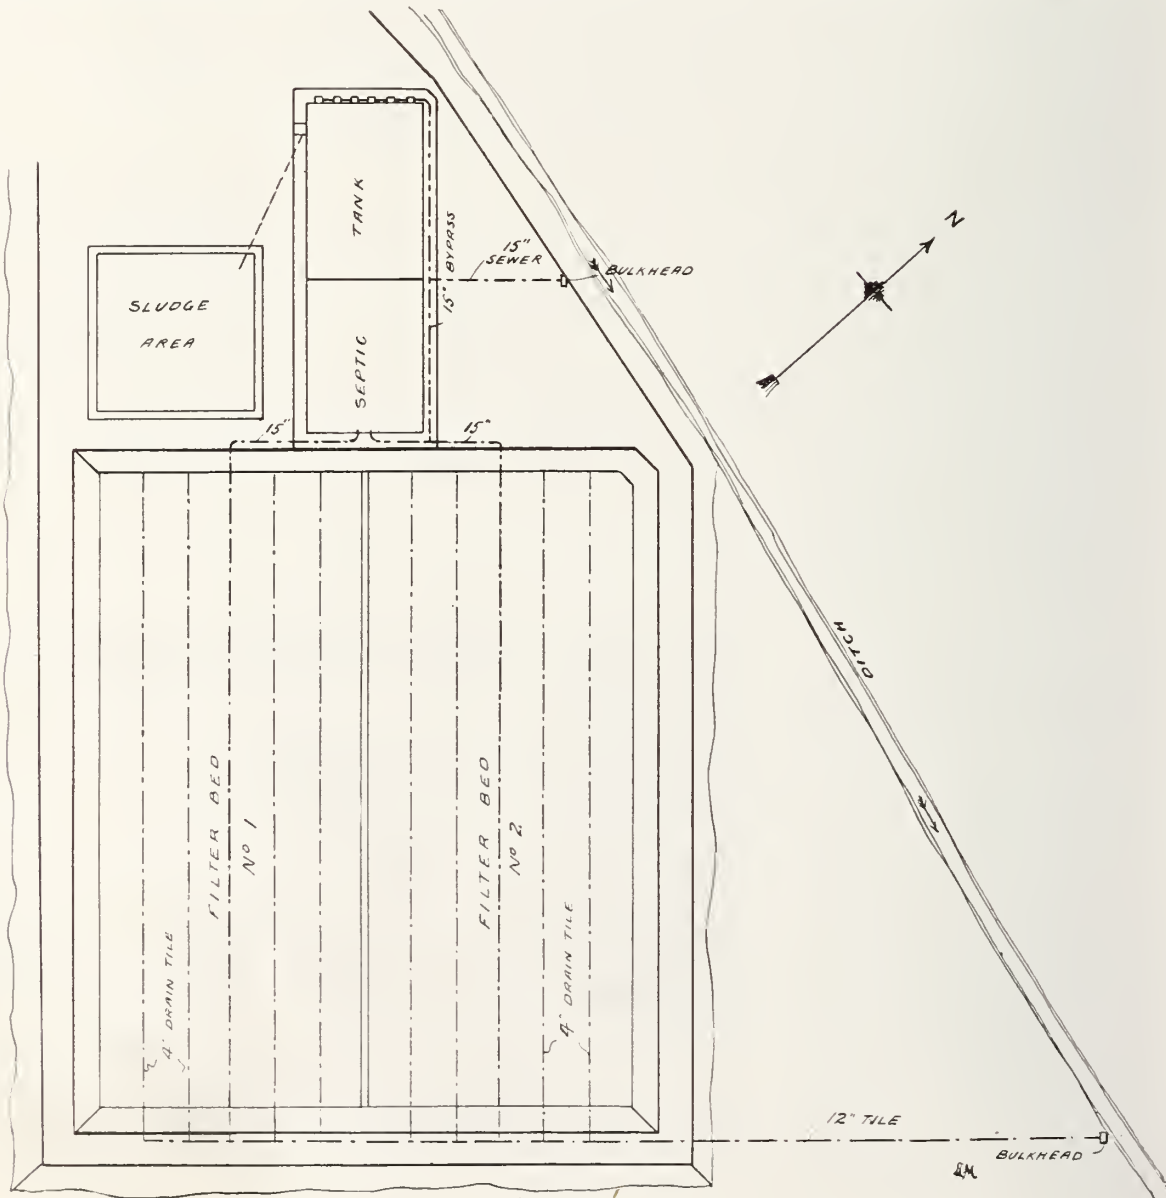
Plan of Sewage Disposal Plant, Carroll, Iowa.
